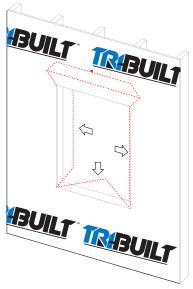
Top flap folded upwards. Jamb and sill flaps folding inward.
